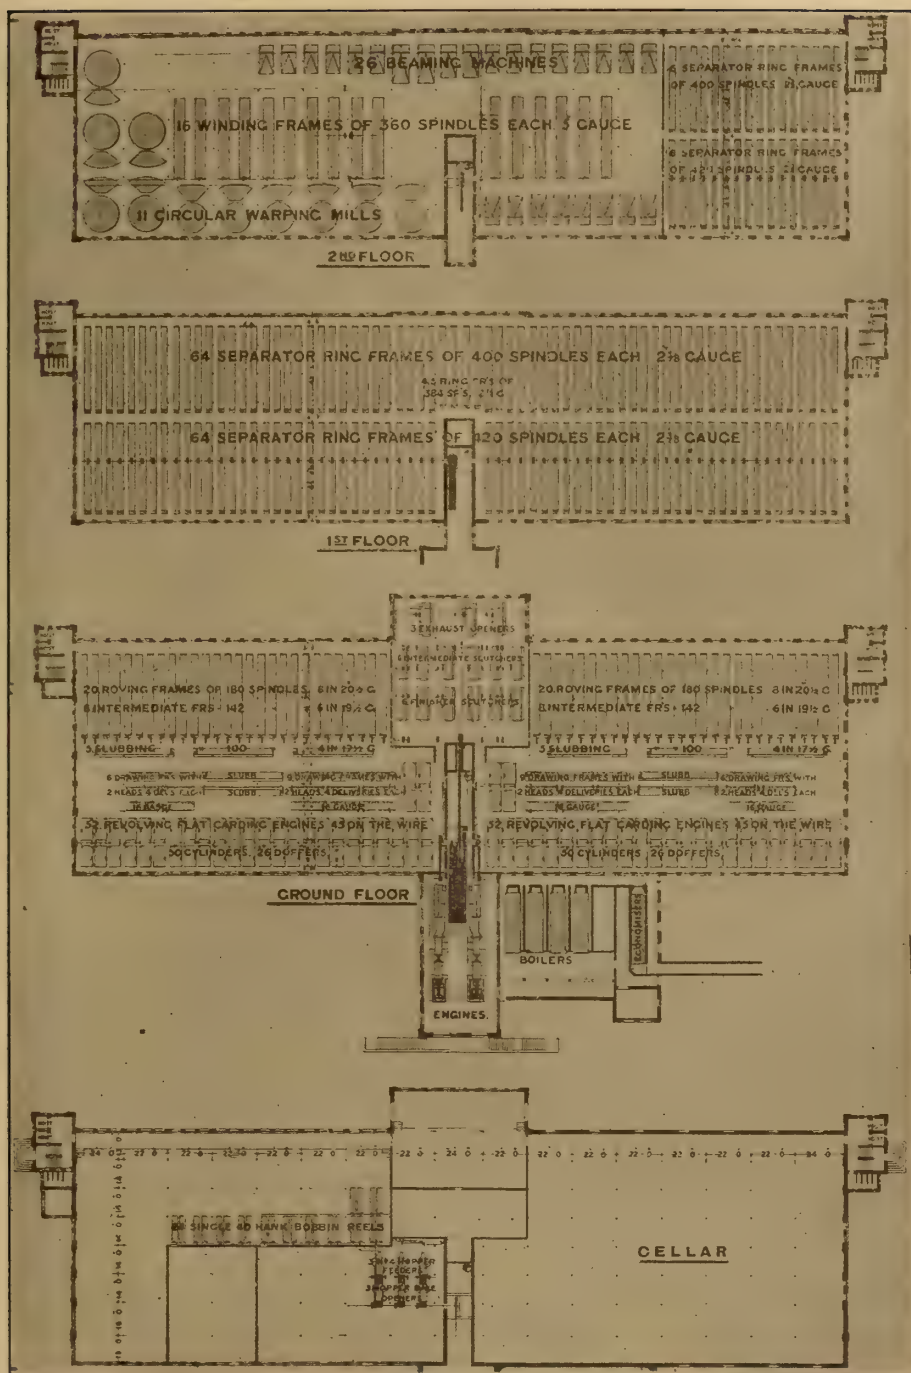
MODERN LANCASHIRE RING SPINNING MILL, 67,136 SPINDLES. HOWARD & BULLOUGH, LTD.,
